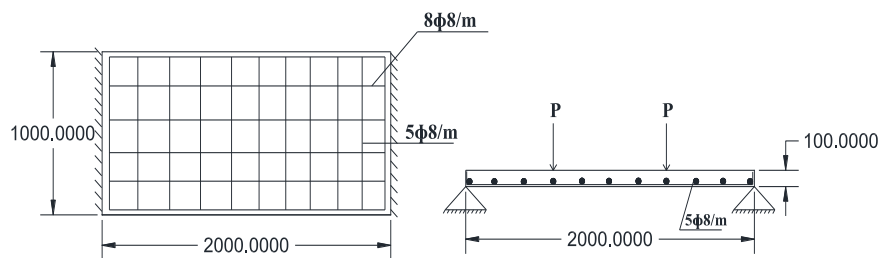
Reinforcement and Concrete Dimensions of Slab S1-1
